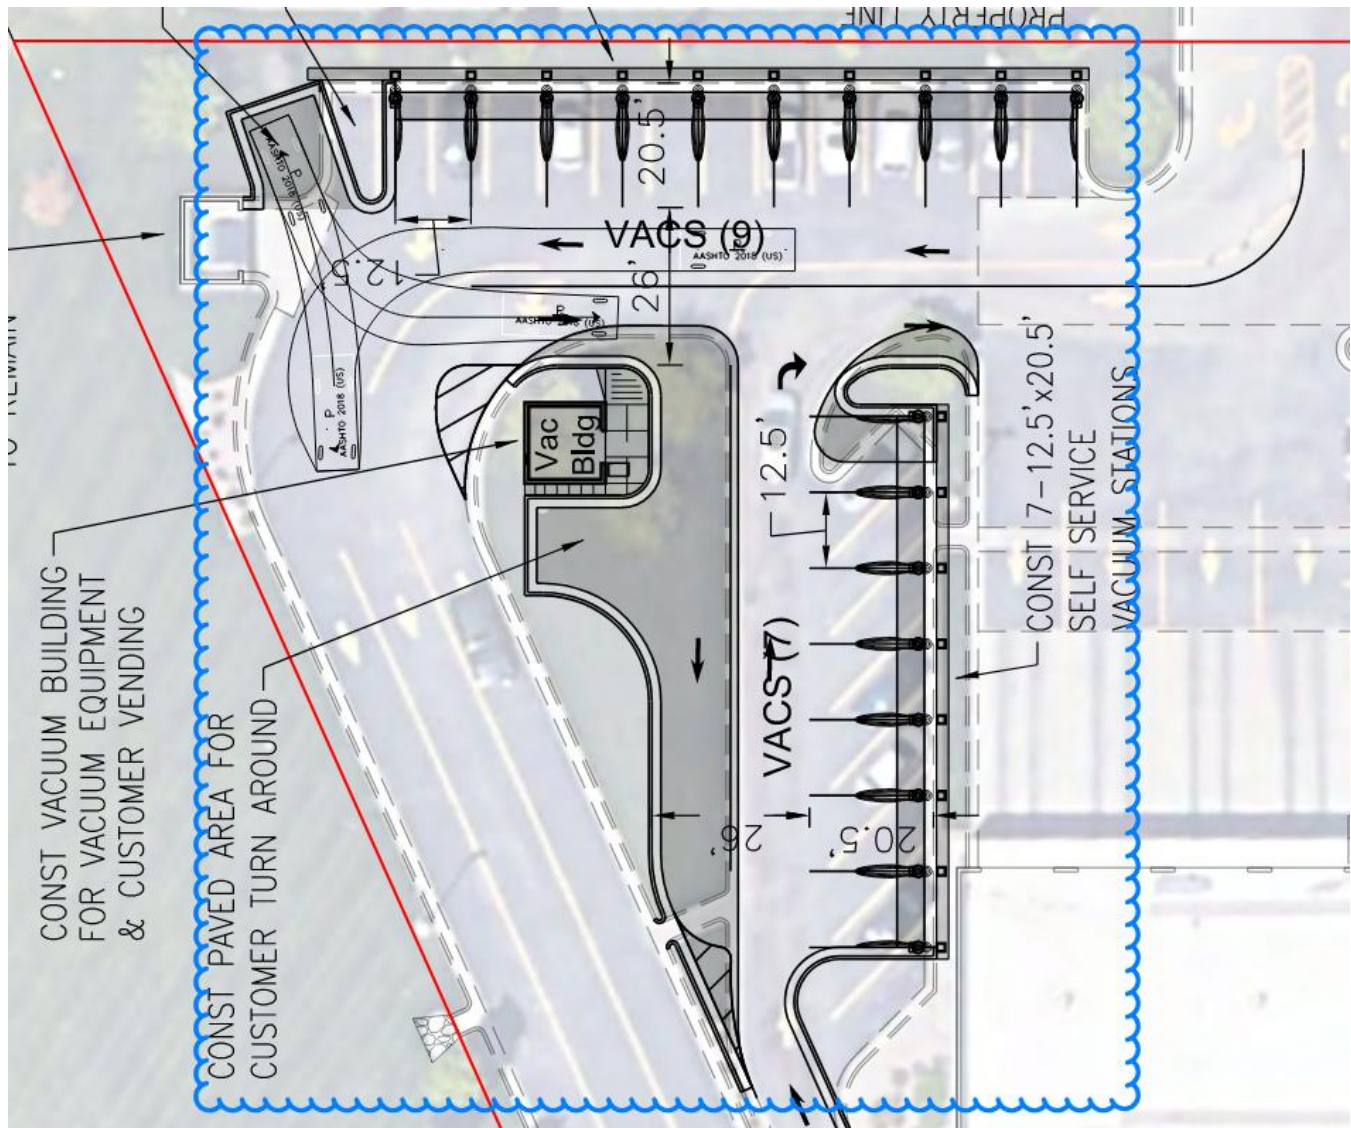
Site plan showing proposed vacuum stations overlaid onto existing parking lot configuration.
